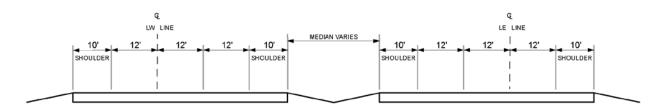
Typical Roadway Section without Auxiliary Lane
